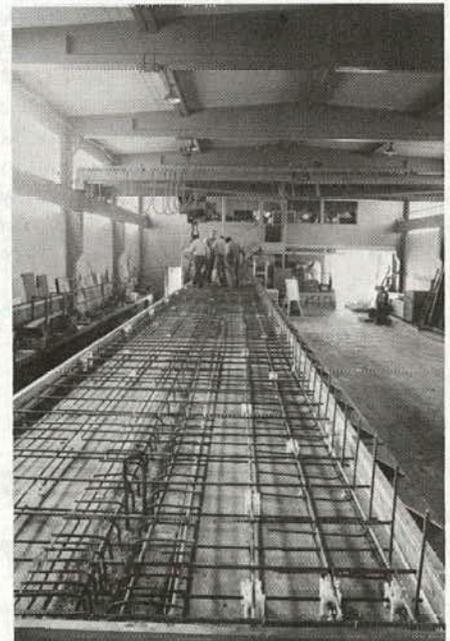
(b). Construction of test girder—deck forms and reinforcing steel.
